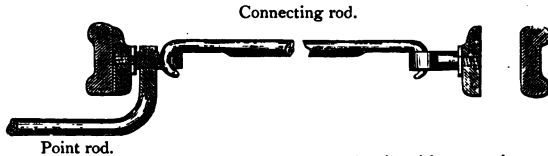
Cross section of a pair of points and stock rails with connecting rod and point rod.
